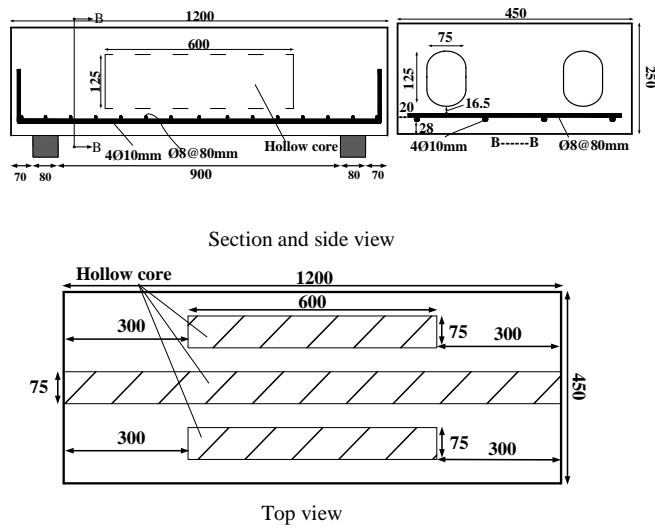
HCS Specimen (HCS-250-B) (All Dimensions in mm)
